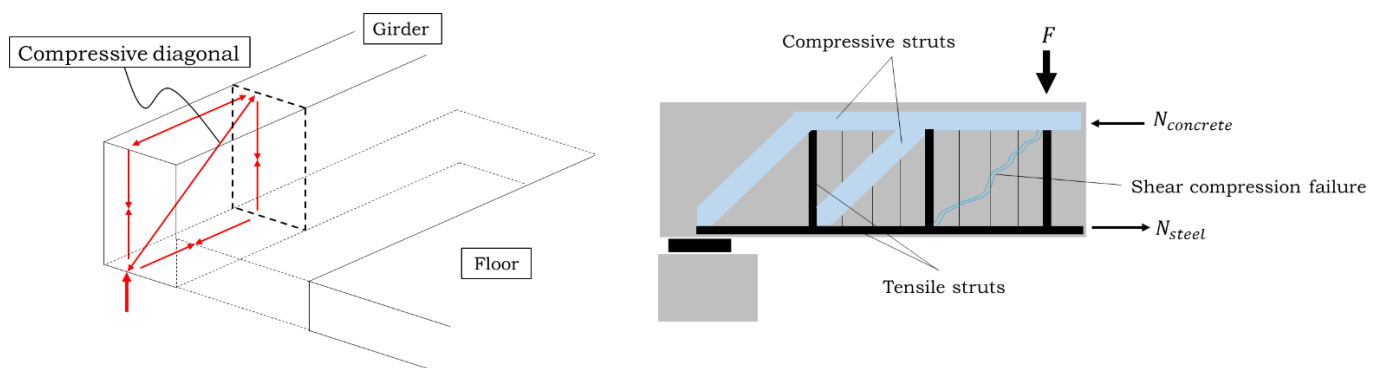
Truss analogy in the girder (left) and shear compression failure (right)
